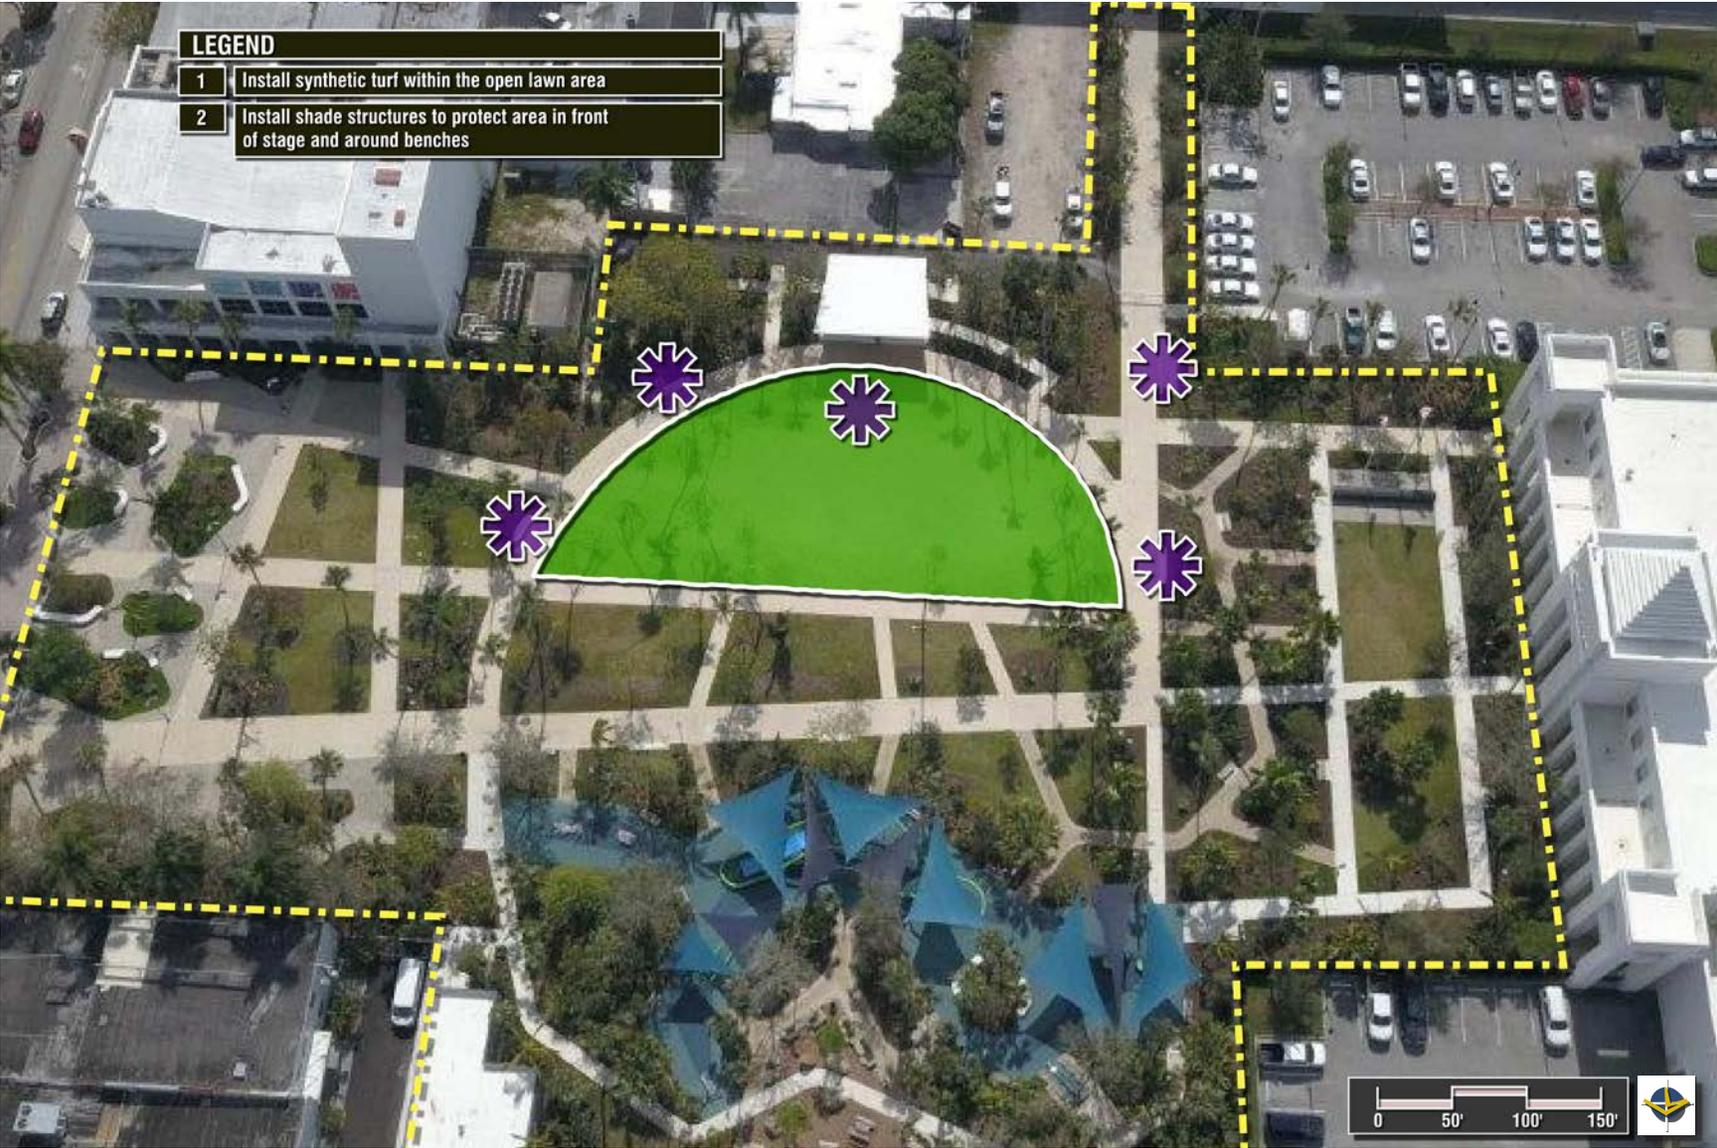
PROPOSED IMPROVEMENTS TO LOSNER PARK (DIAGRAM)
